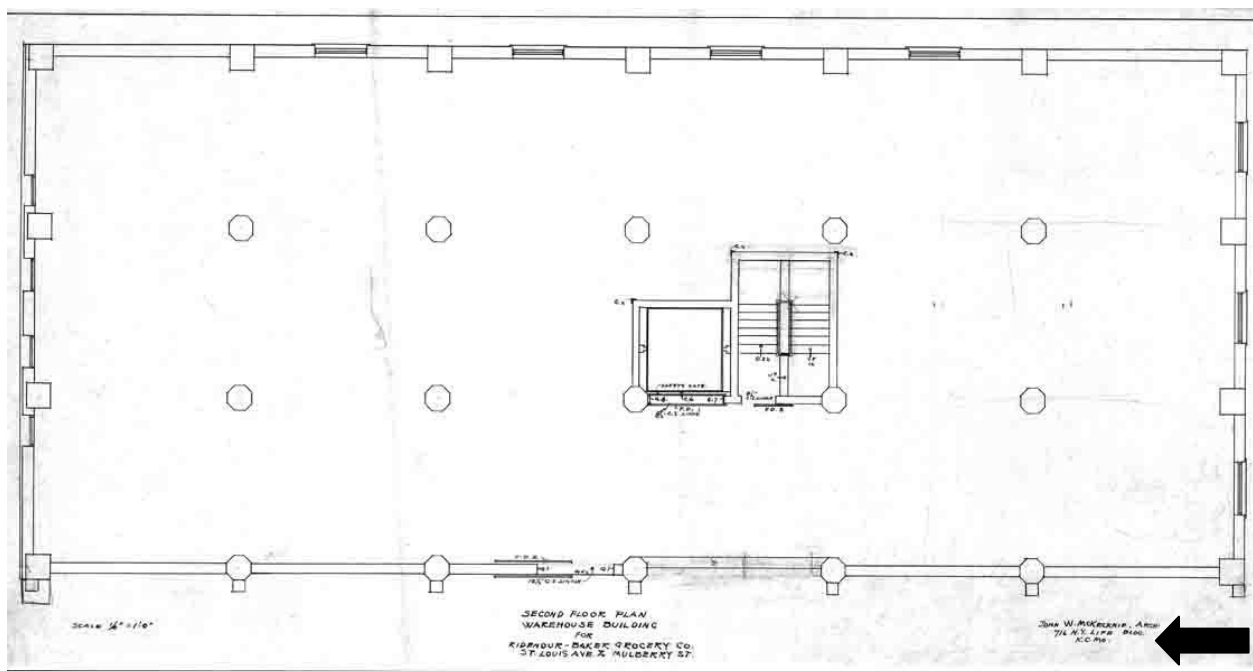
Historic Plans, 1910 block, typical upper floor plan. Source: *The State Historical Society of Missouri, Kansas City.
